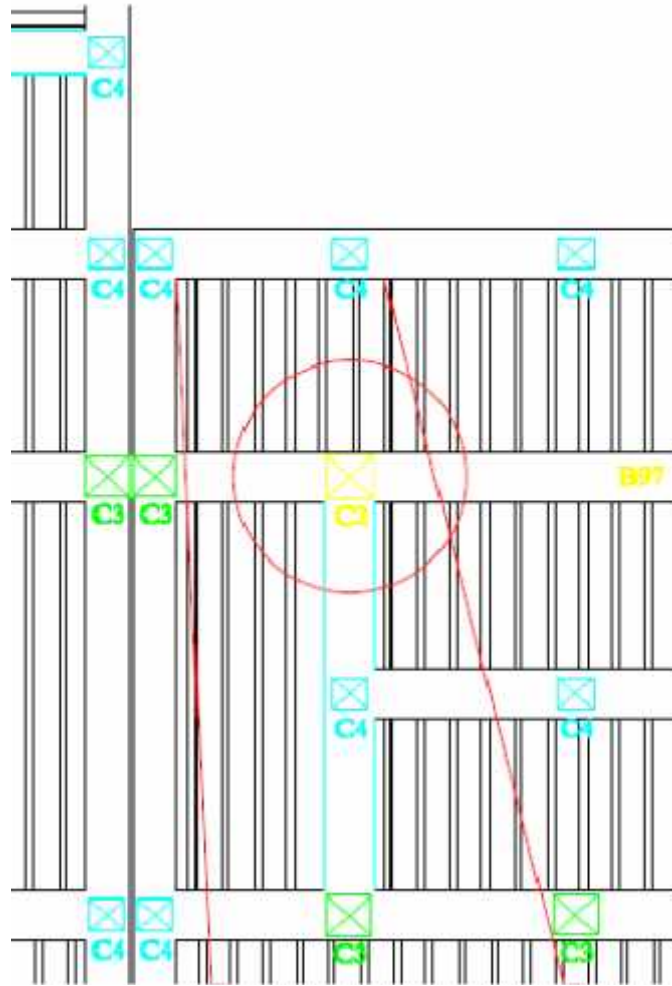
Place Of Column (C2-C3) within the first floor.
